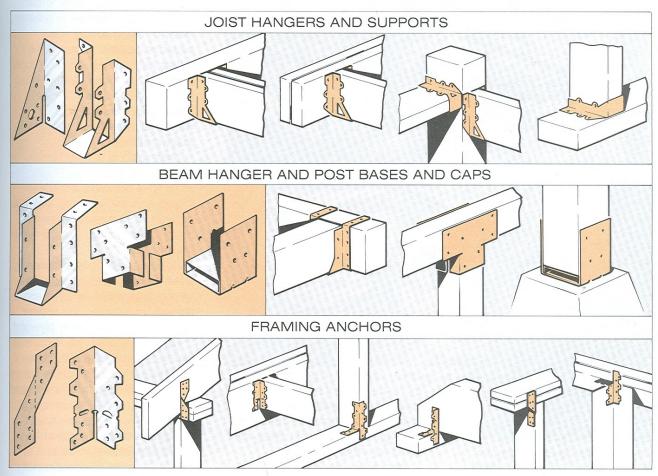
Some typical metal fasteners used to tie together members in wood-framed construction.
